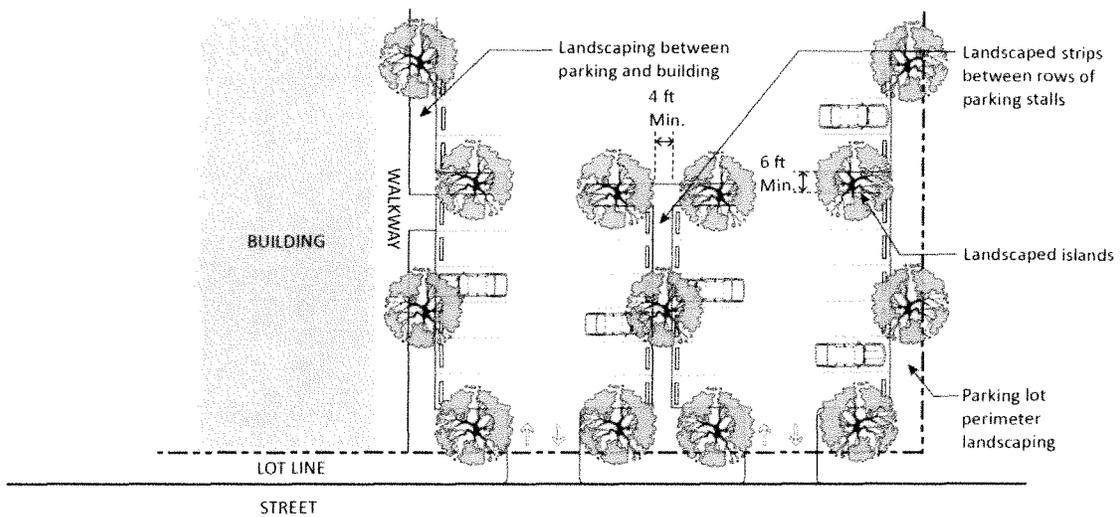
L: PARKING AREA LANDSCAPING
